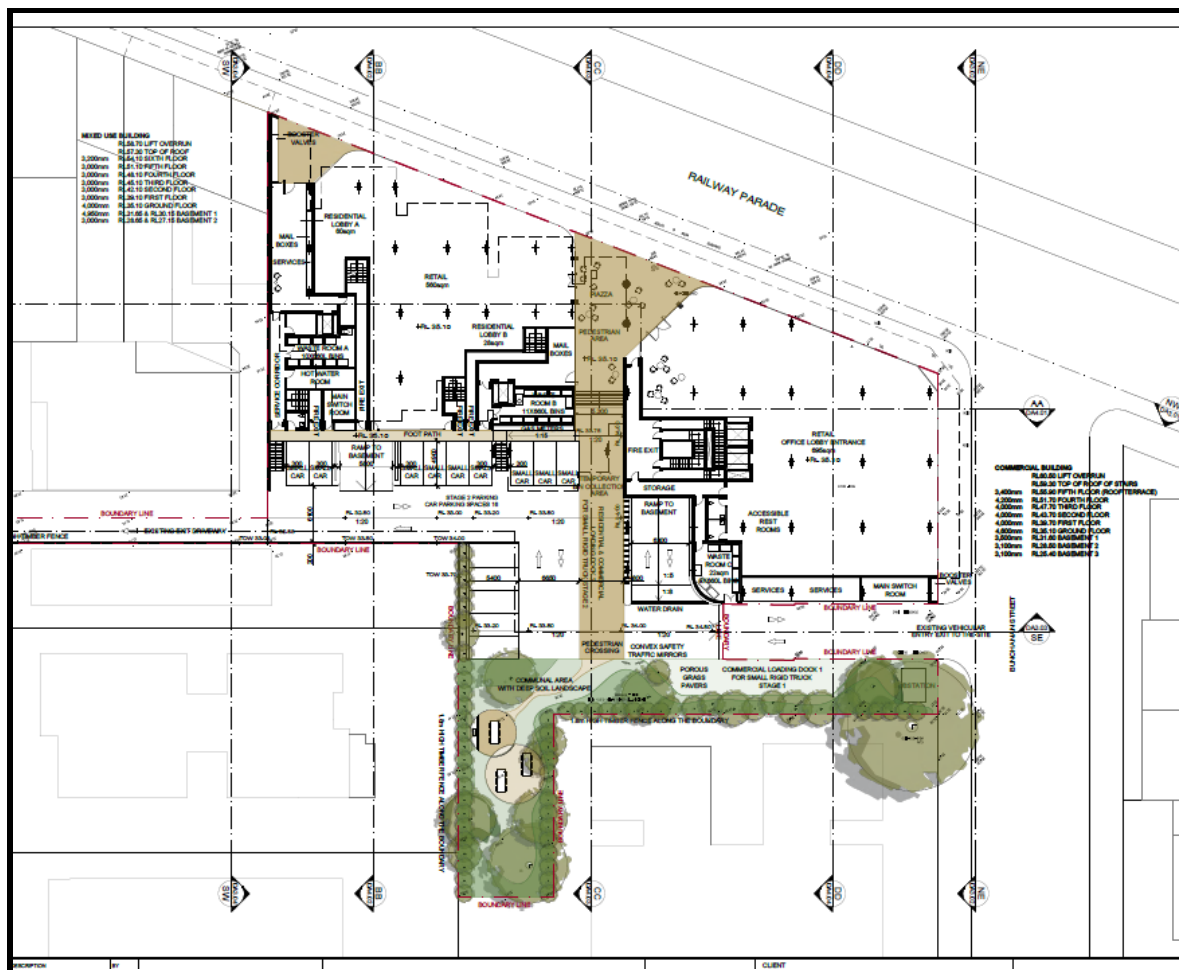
Previous proposal - Ground Floor (Source: Marchese Partners, May 2019)
